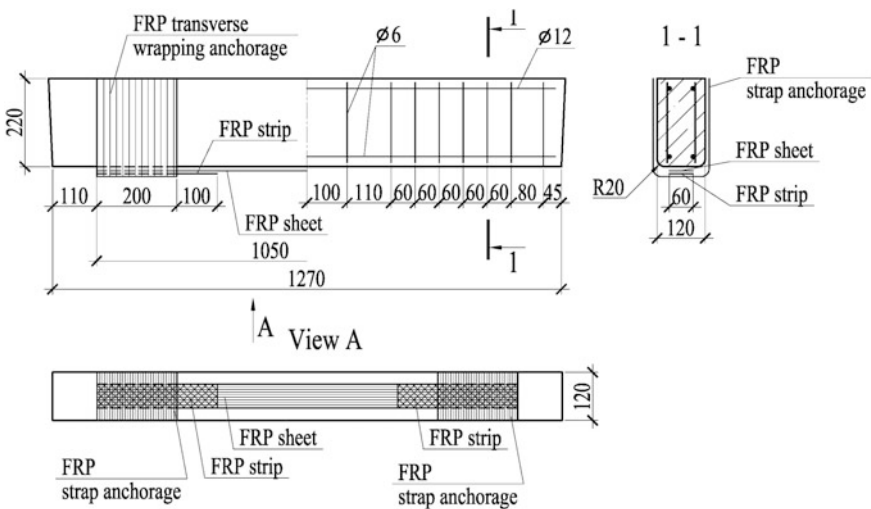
Reinforcement scheme of beams with steel and a carbon fiber sheet
